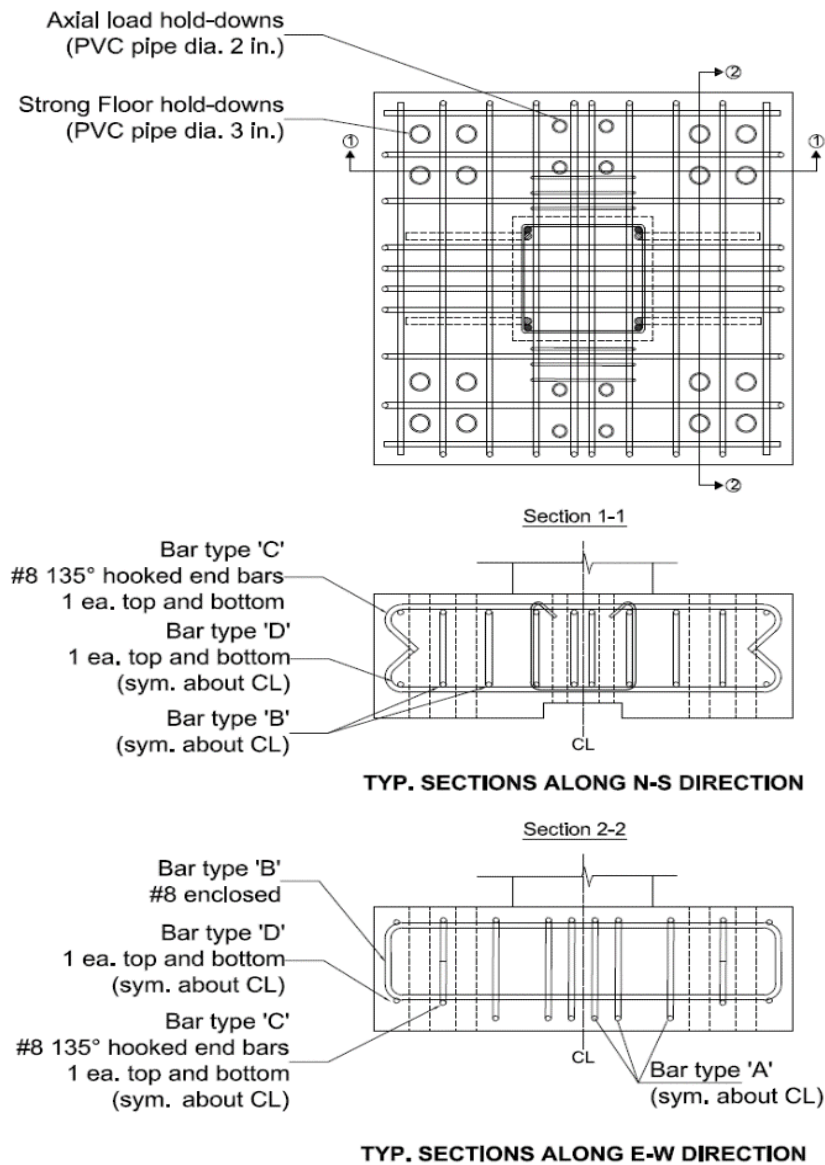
Additional reinforcing steel near column loading point for tall columns
